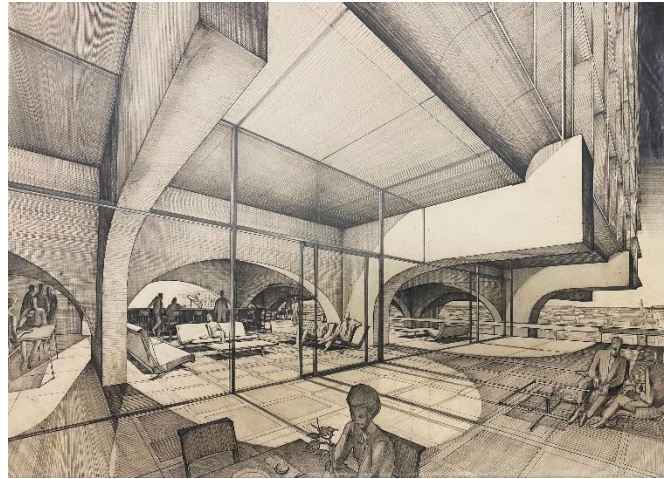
Rendering by Maule of unrealized roof terraces. Other design features shown, such as arched concrete columns and precast window screen, were constructed in the final design. Source: University of California, Berkeley, Environmental Design Archives.
